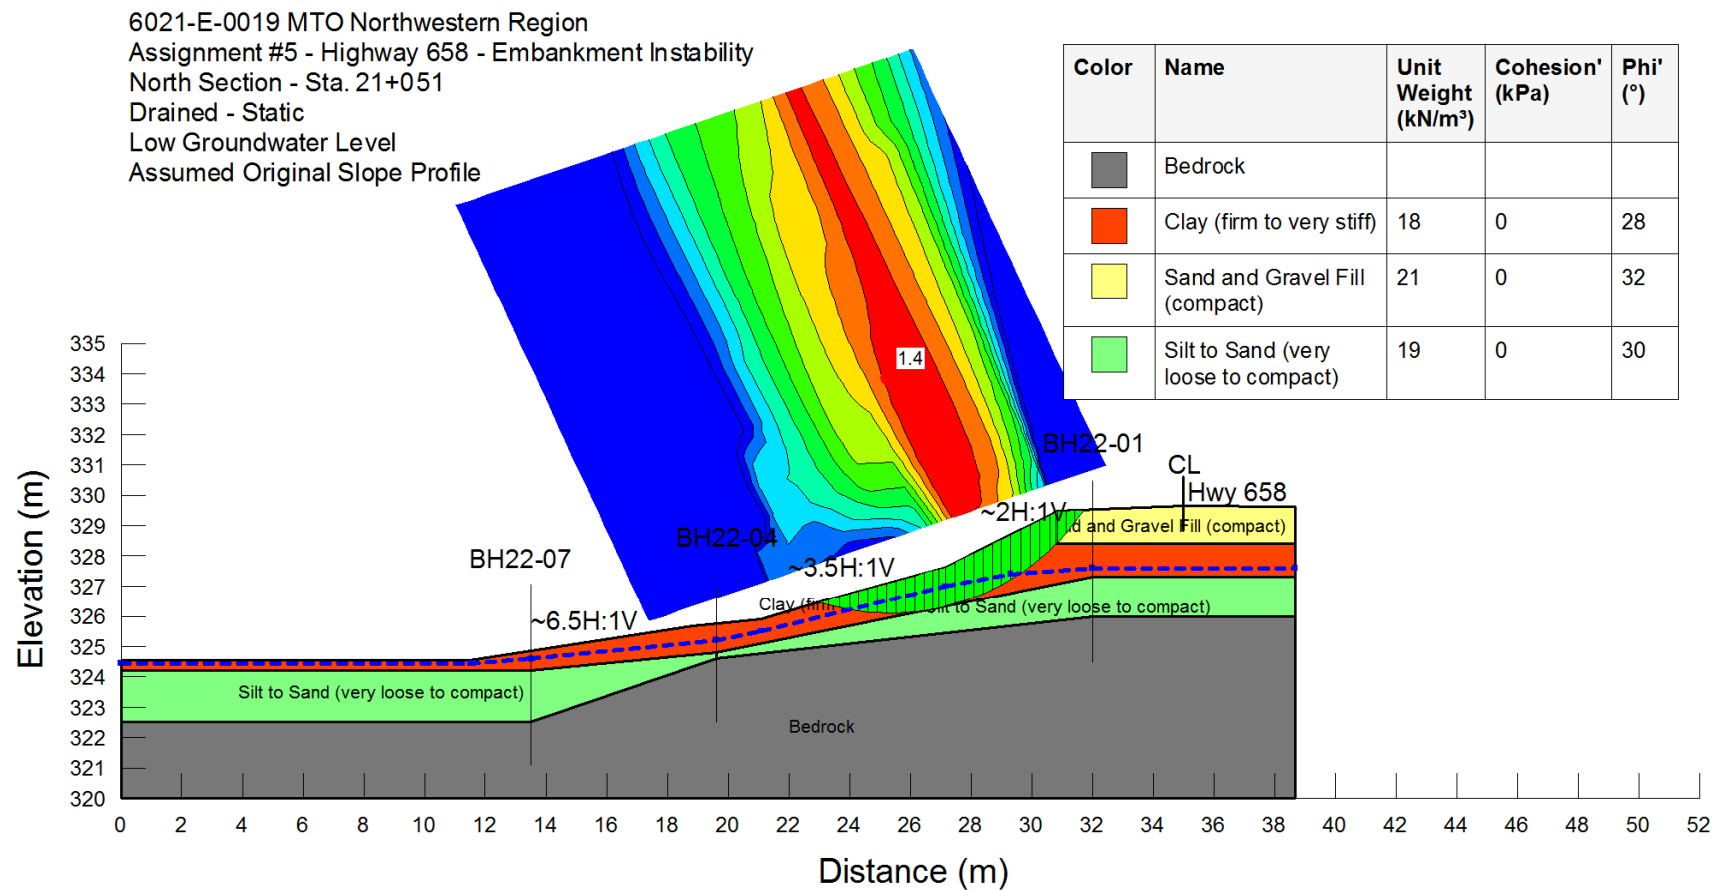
North Section D-D' (Sta. 21+051) – Slope Prior to 2022 Failure, Assumed Original Slope Profile, Low GWL – Drained Static Conditions
